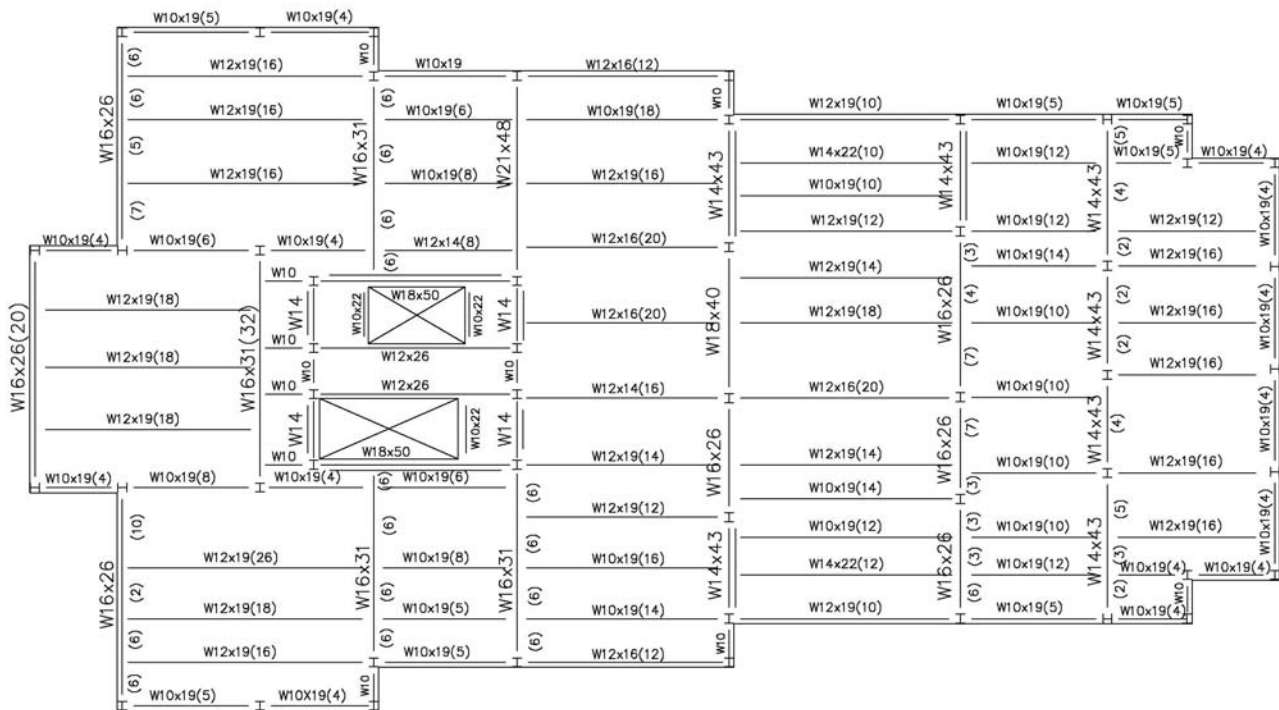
First floor structural plan utilizing steel beams and girders with composite steel deck
